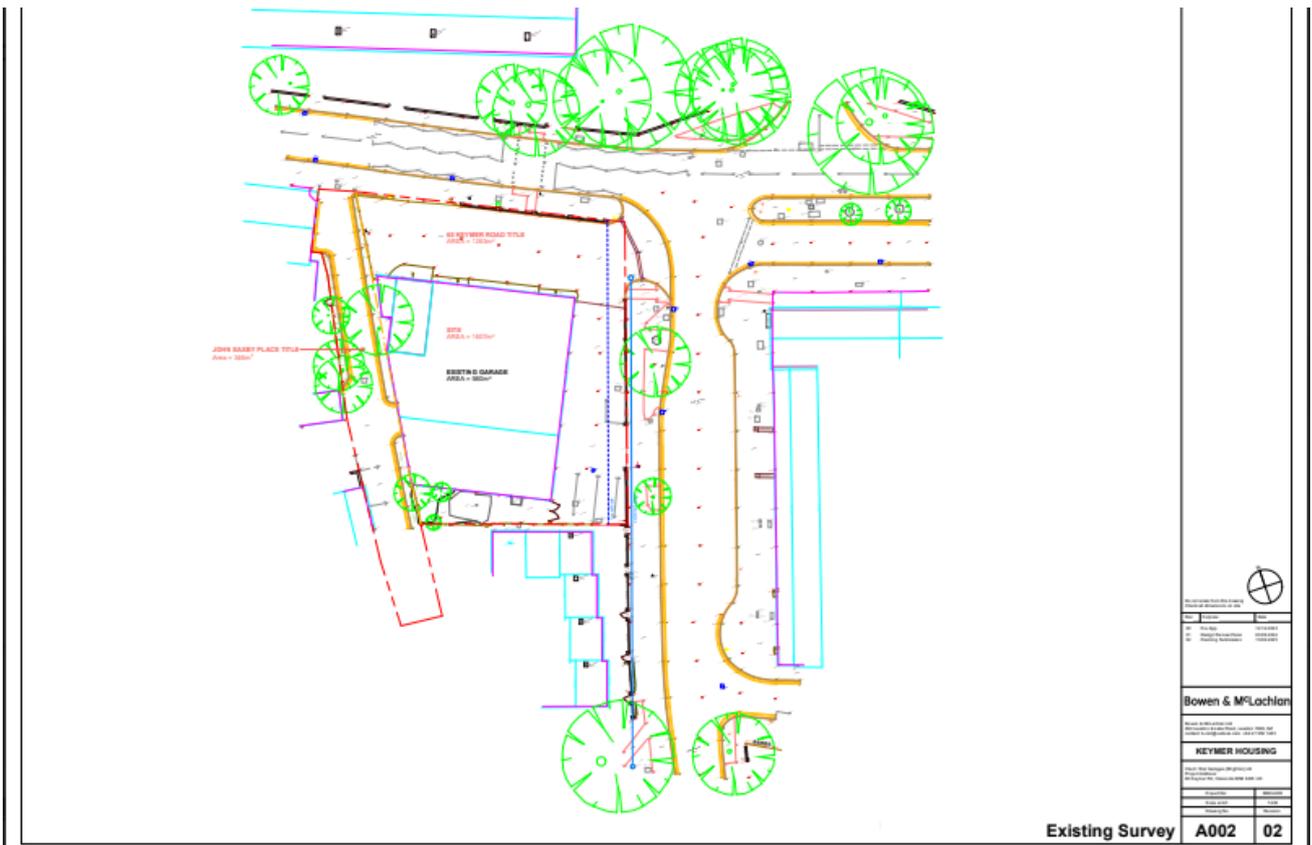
Existing Site plan © Bowen and Mc.Lachlan Ltd drawing number A002 revision 02.
